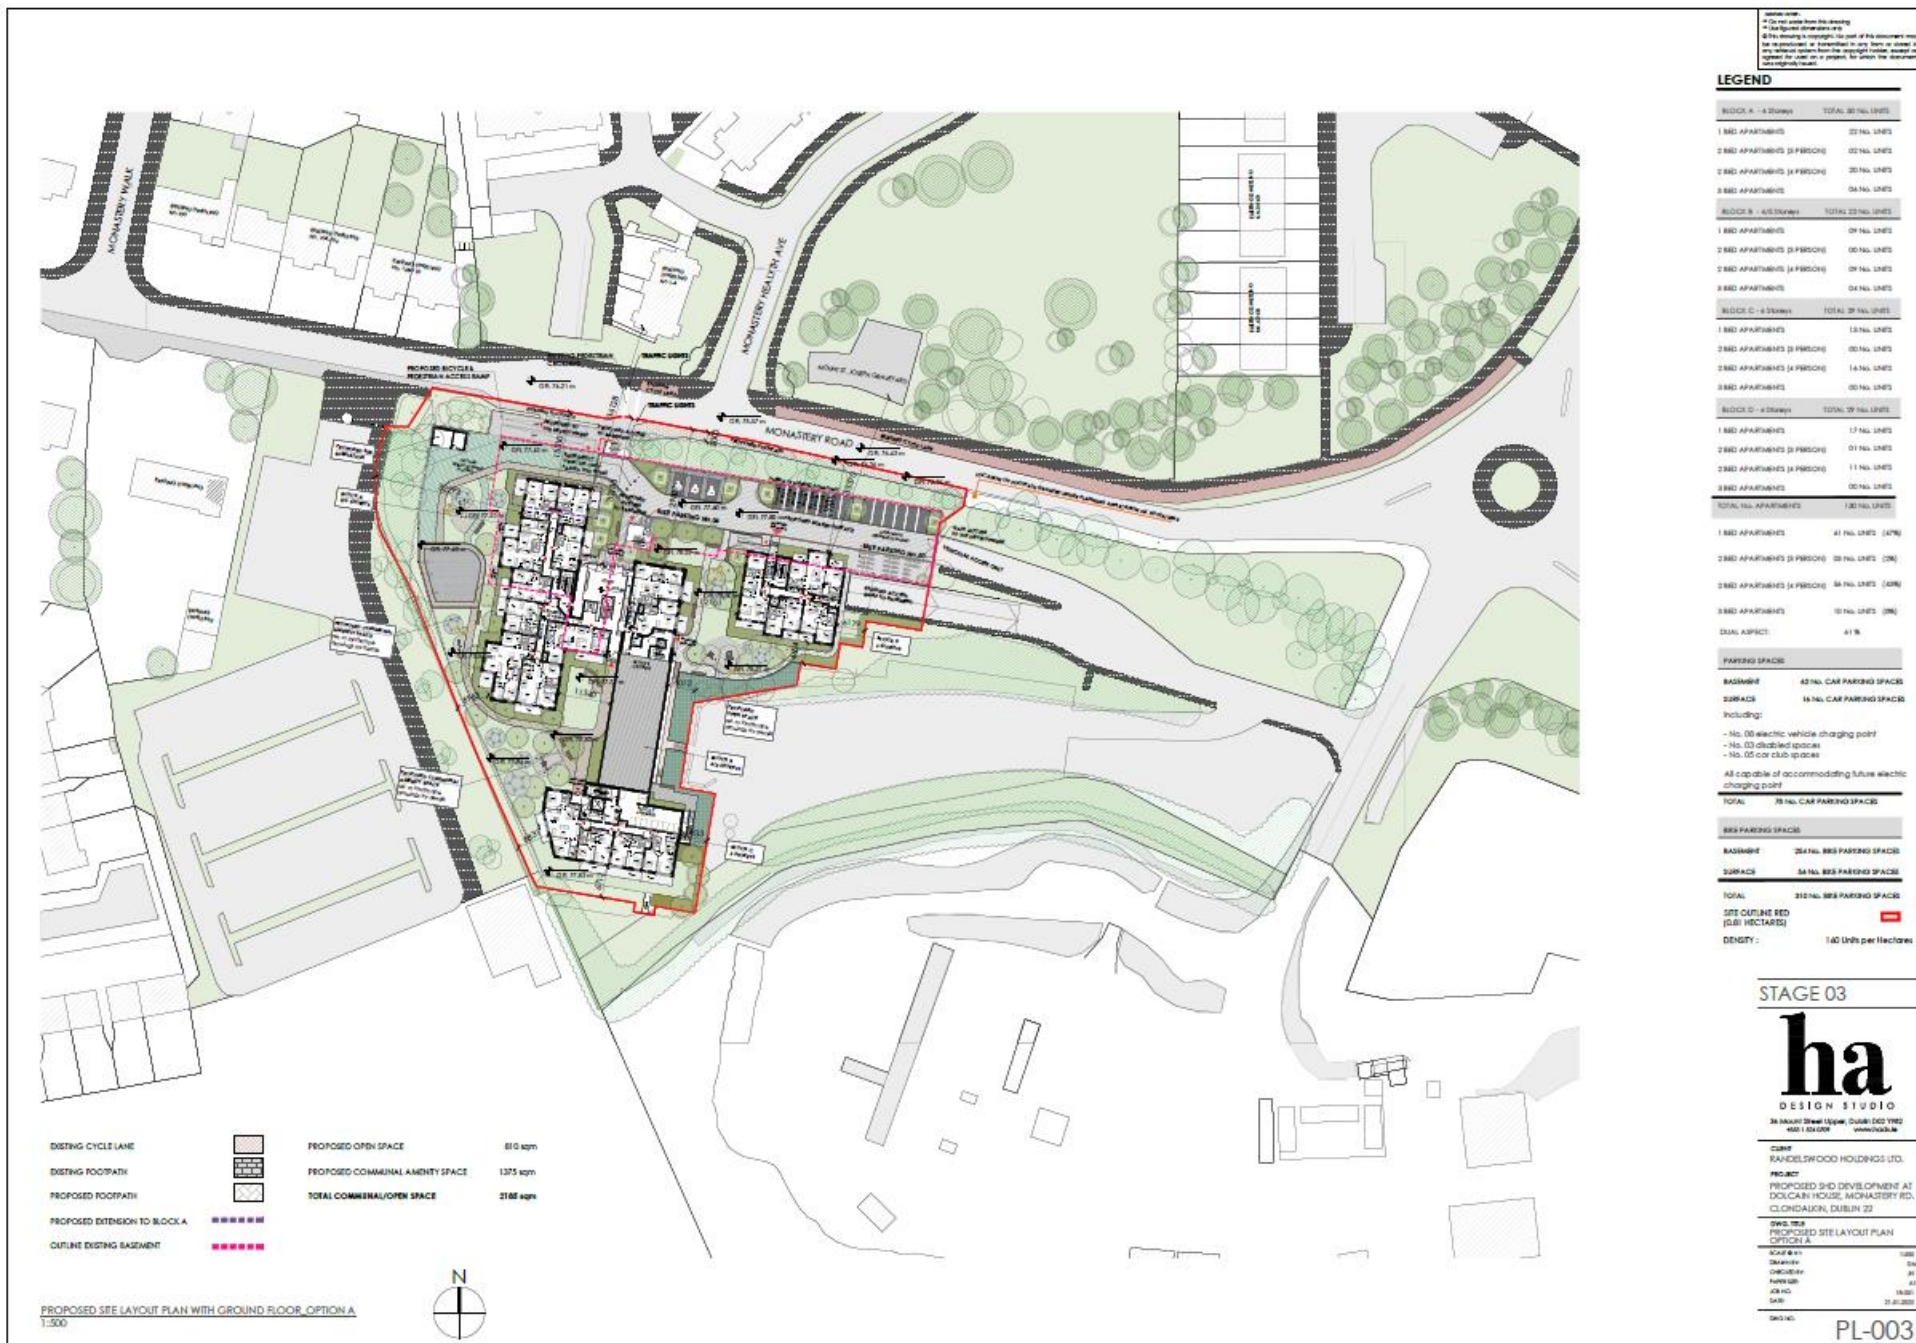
Proposed site layout plan – Option A (incl. footpath)
